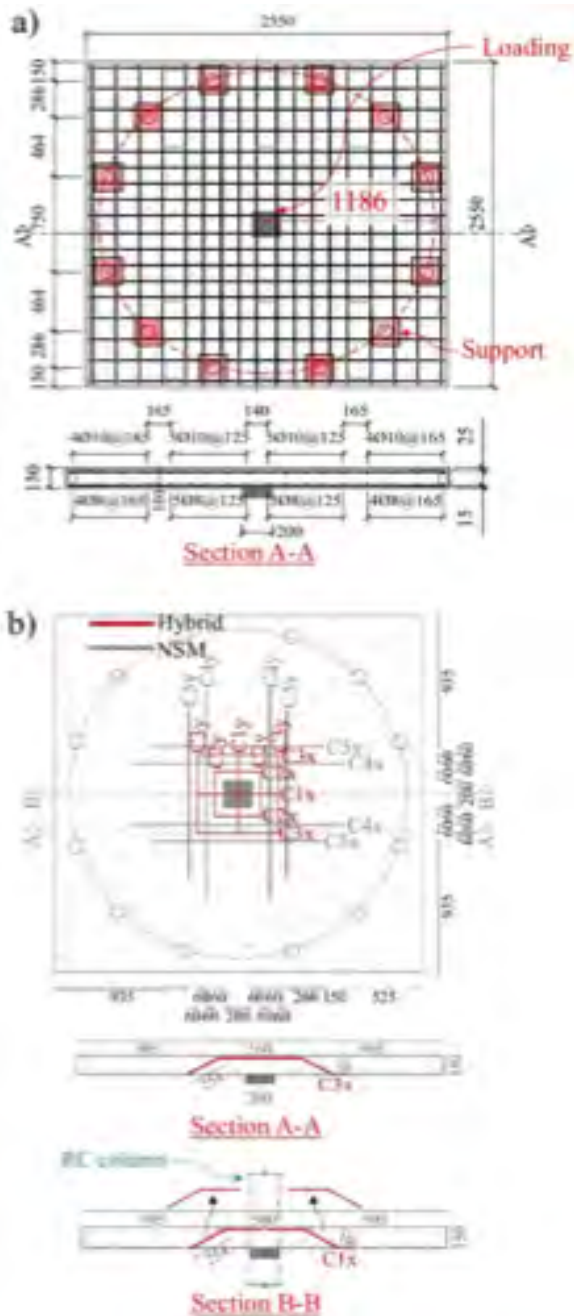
a) Loading and support conditions, and steel reinforcement details, b) CFRP strengthening details.
